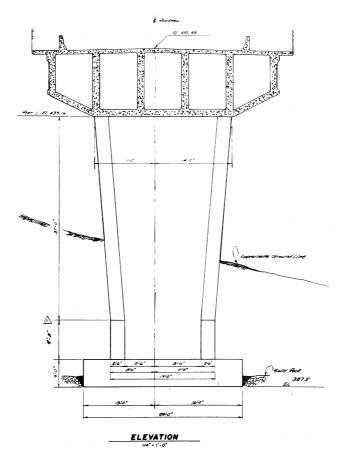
Typical section of Stewart Park Bridge at pier.
